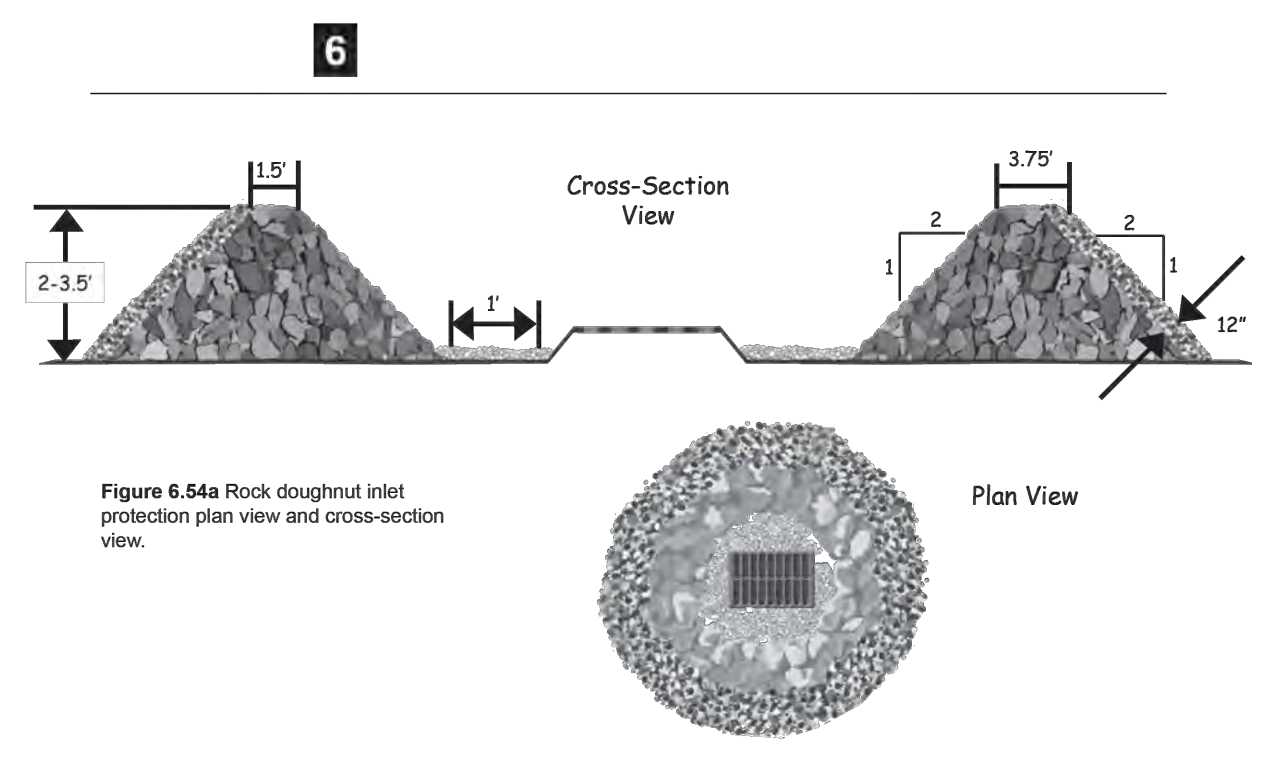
Rock doughnut inlet protection plan view and cross-section view.
